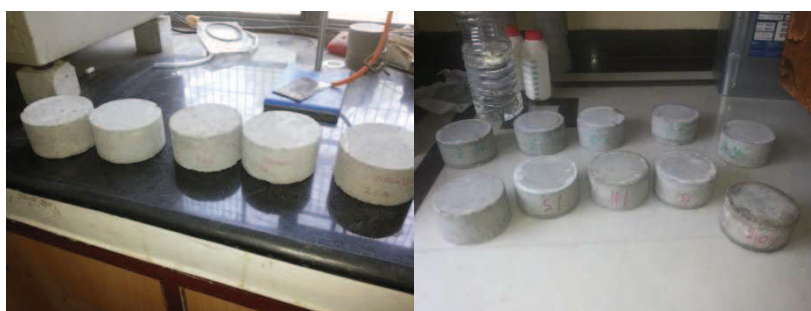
Cylindrical specimens of size 51 mm x 100 mm
